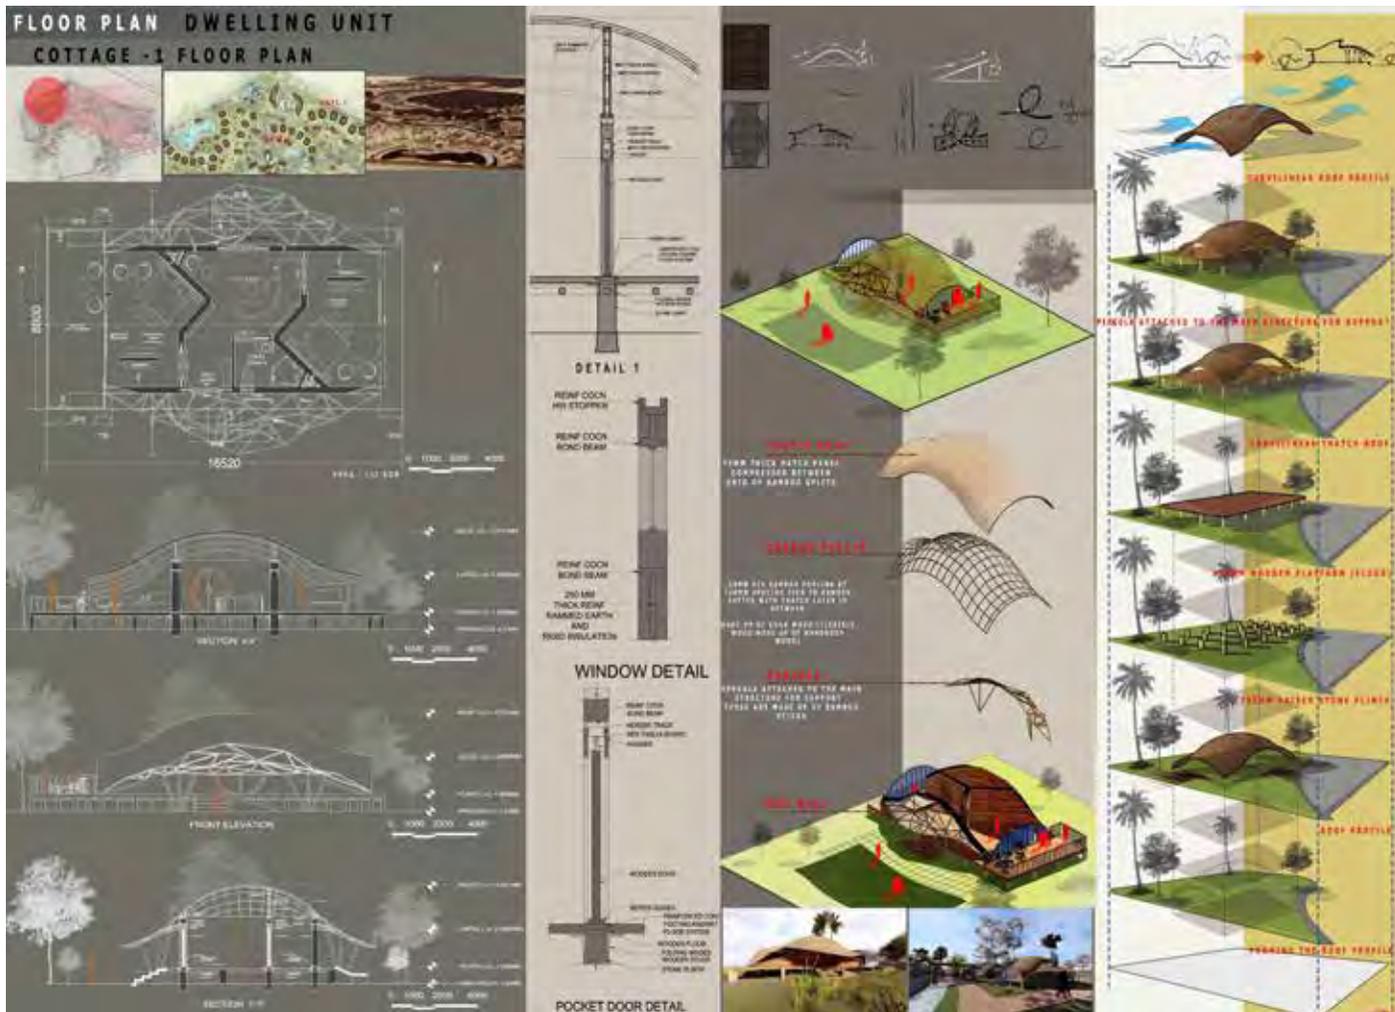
Floor Plan and Details of Cottage (Source: Author)
